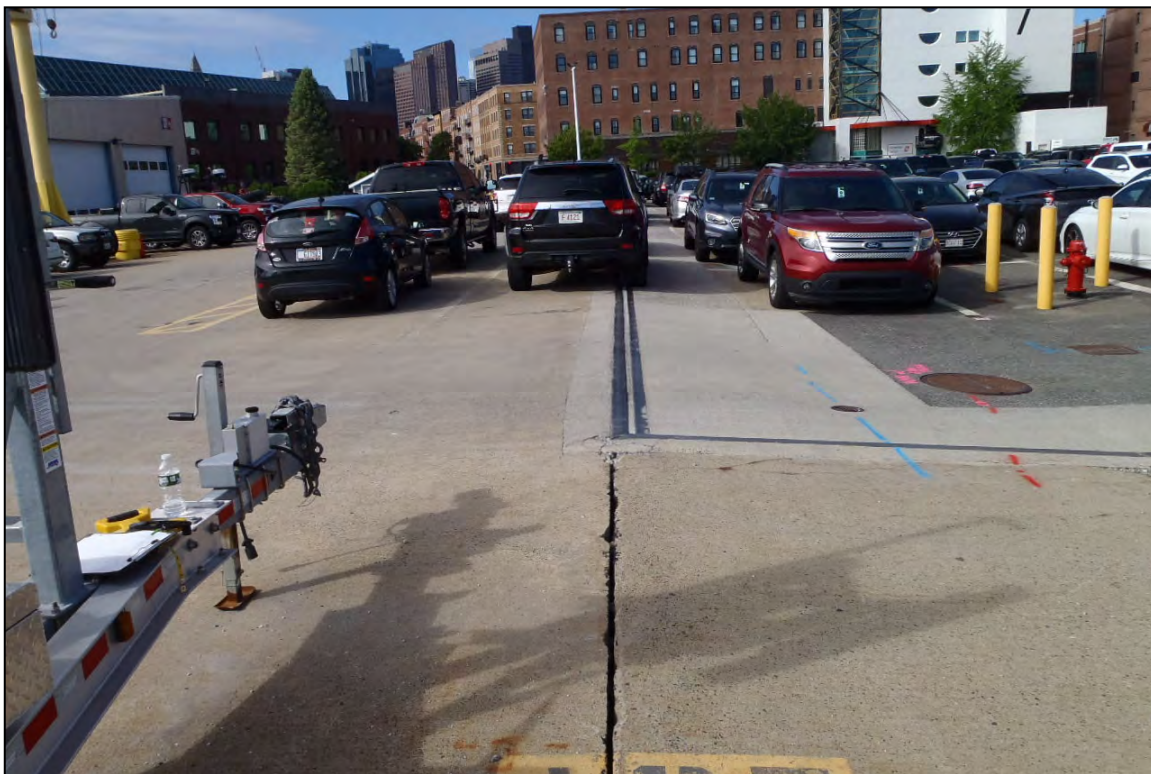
View of Wharf 3 and the expansion joint on the north side of the structure.
